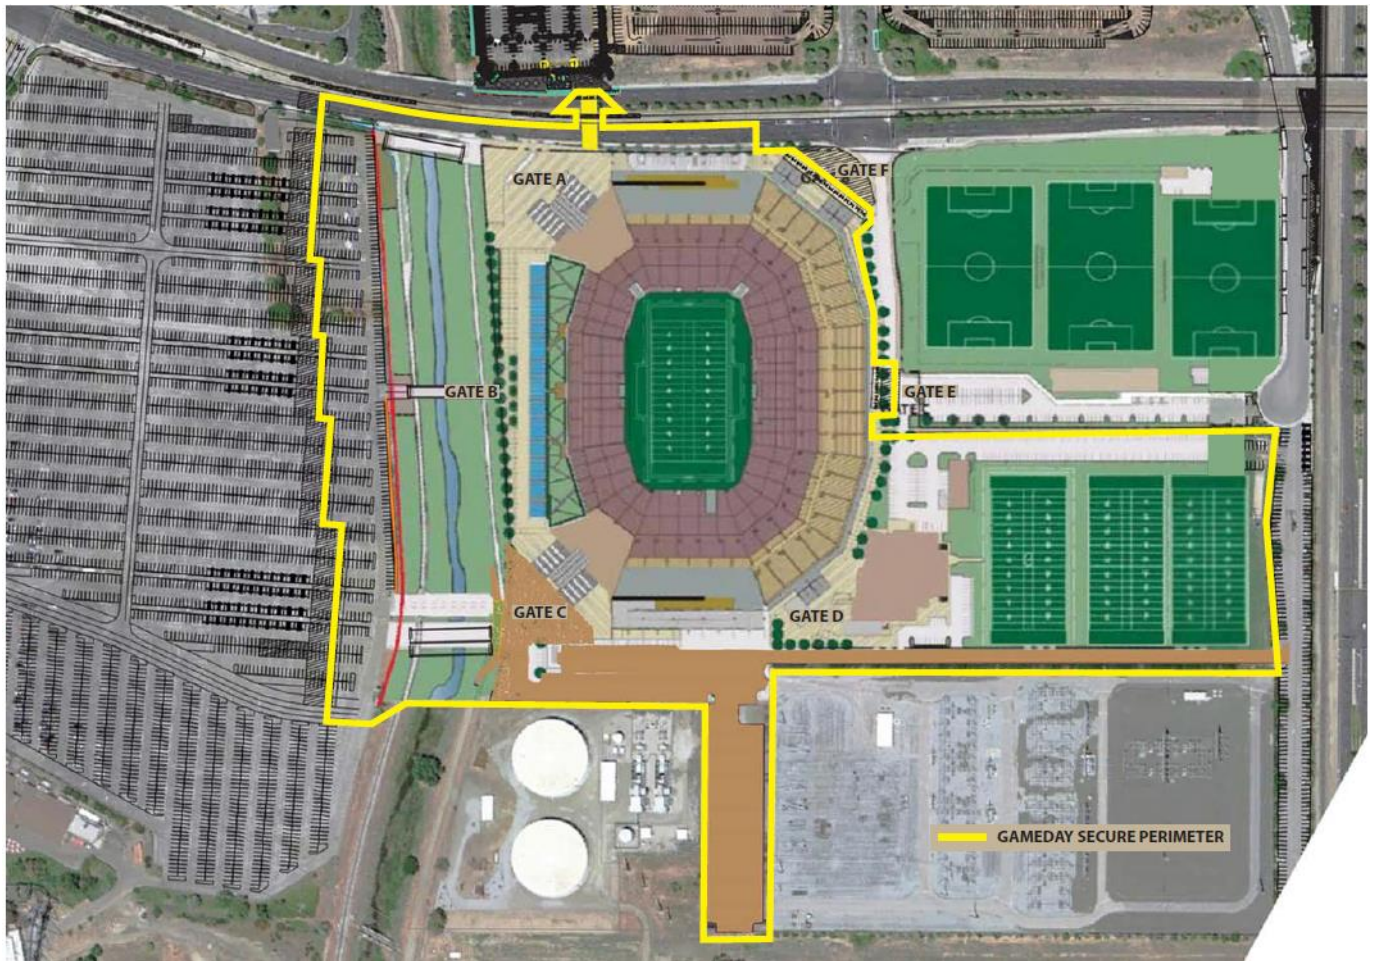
Pedestrian Access to Parking Facilities on Event Days
